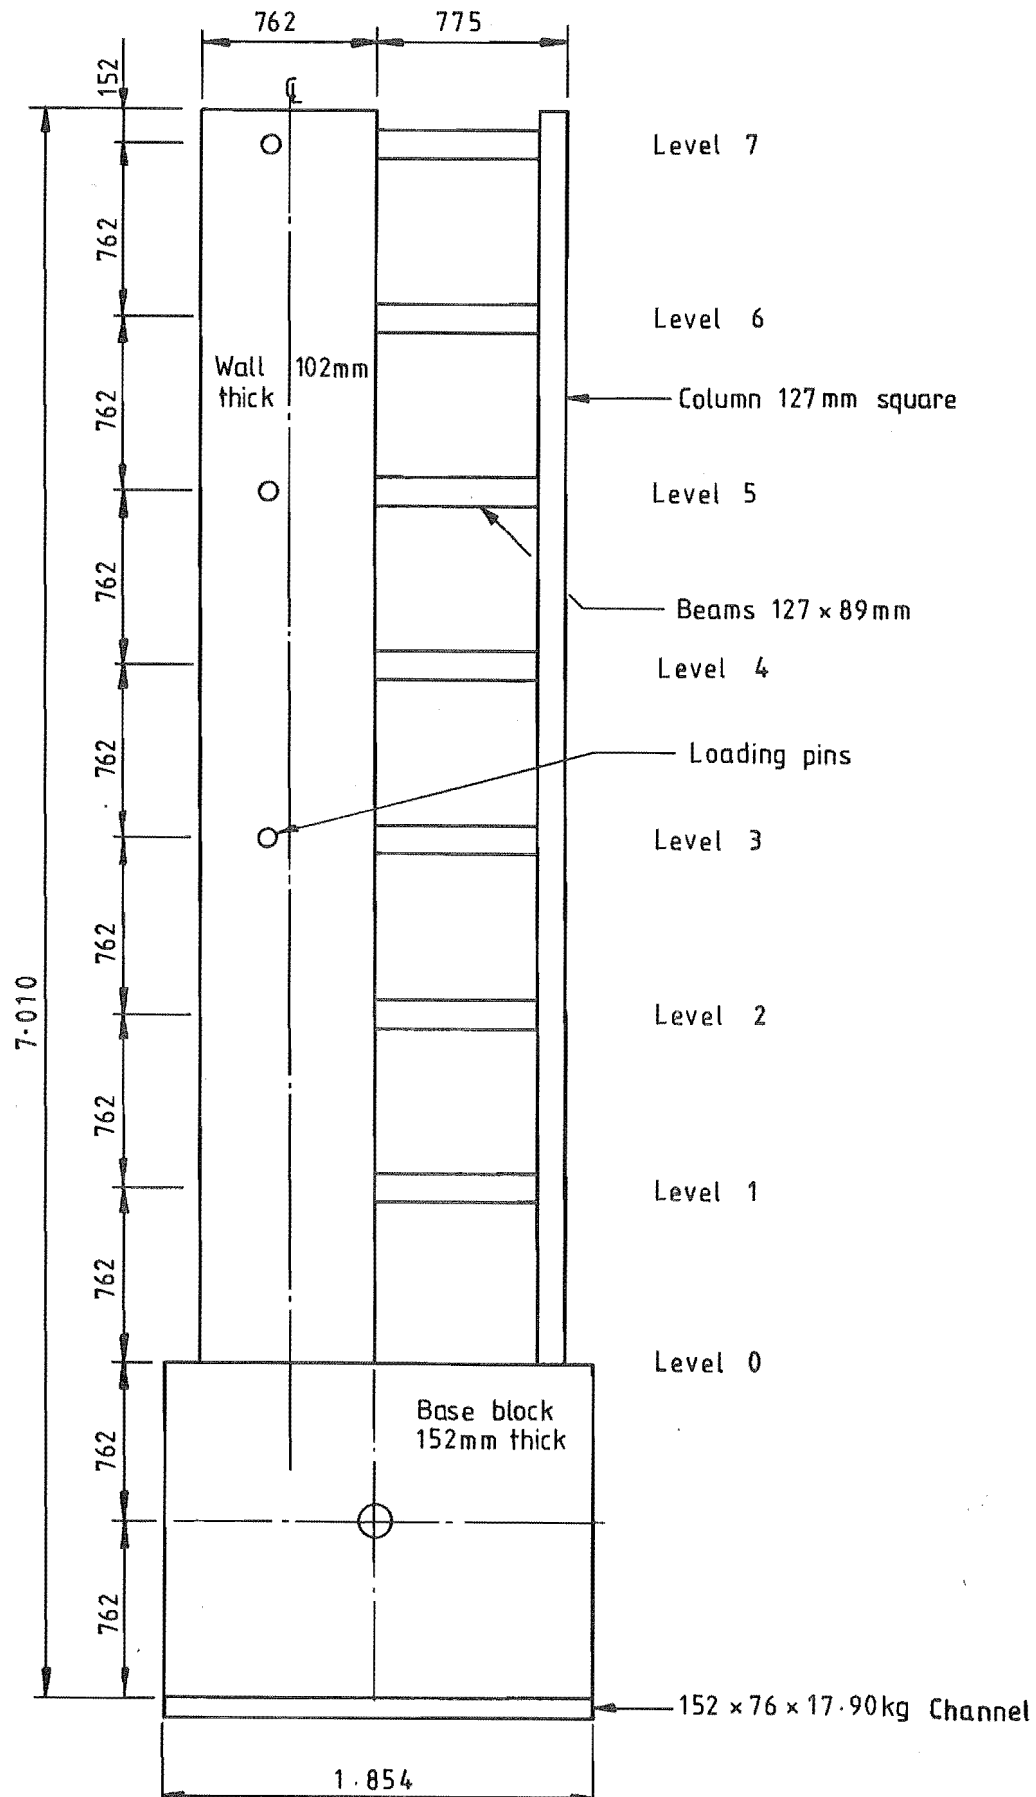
GEOMETRY OF FRAME-WALL SPECIMENS FSW-1 AND FSW-2
